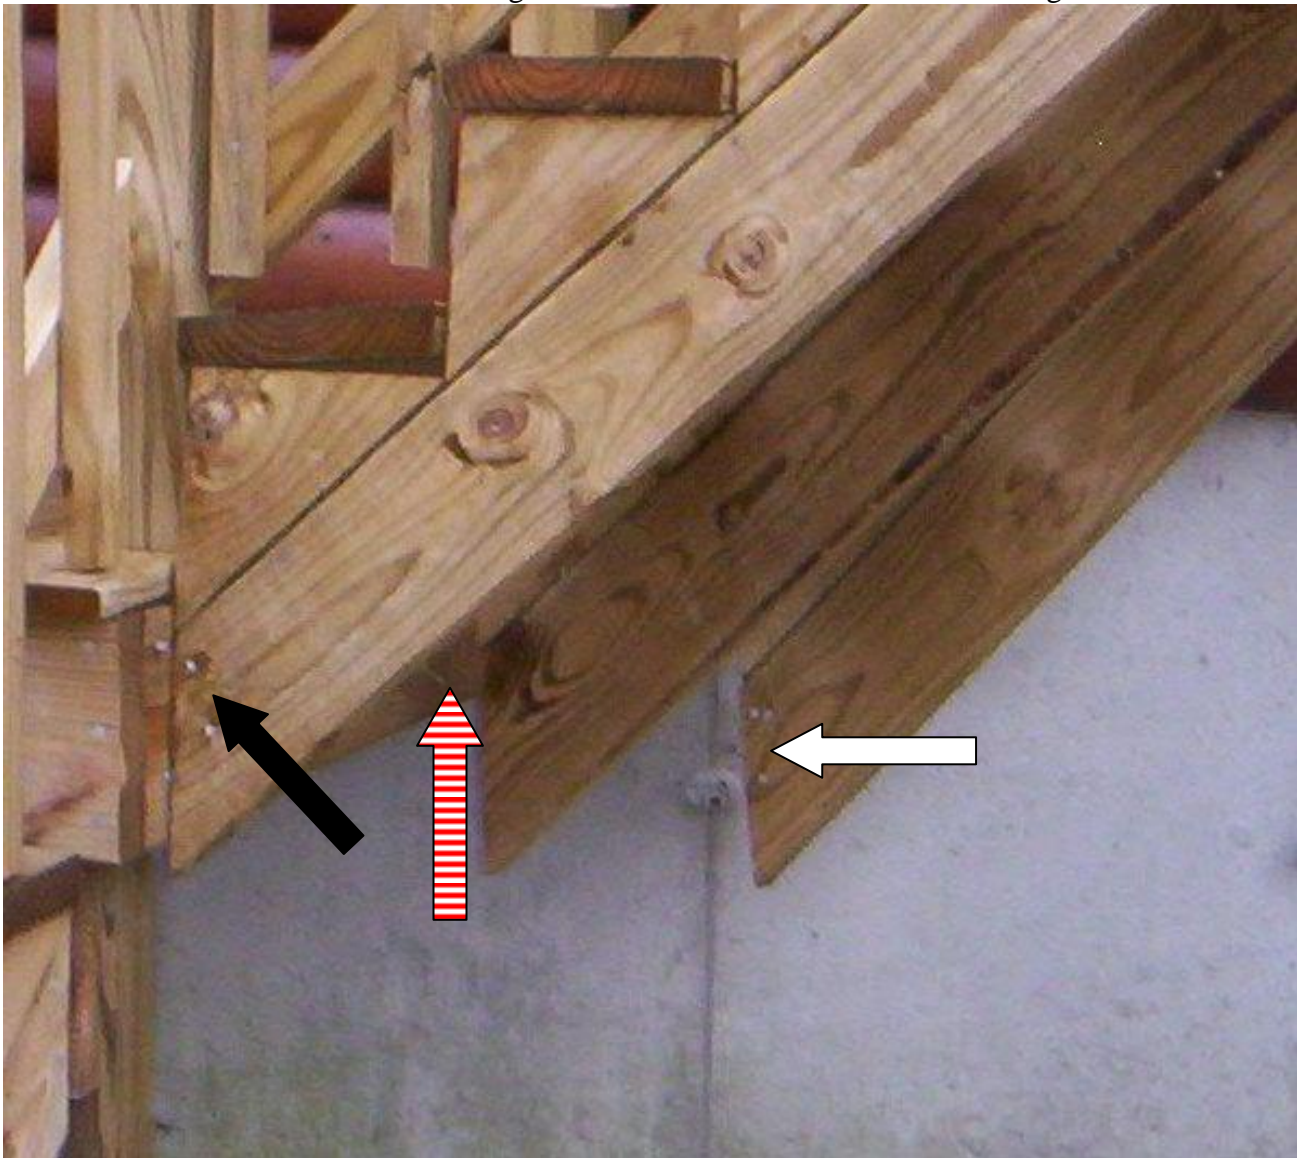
0988 was cropped when shown as Exhibit #1 at 9/14/12 deposition of carpenter. Detached inboard stringer (adjacent to house) was cropped out of the exhibit photo. Detached center stringer is barely visible in exhibit photo.
